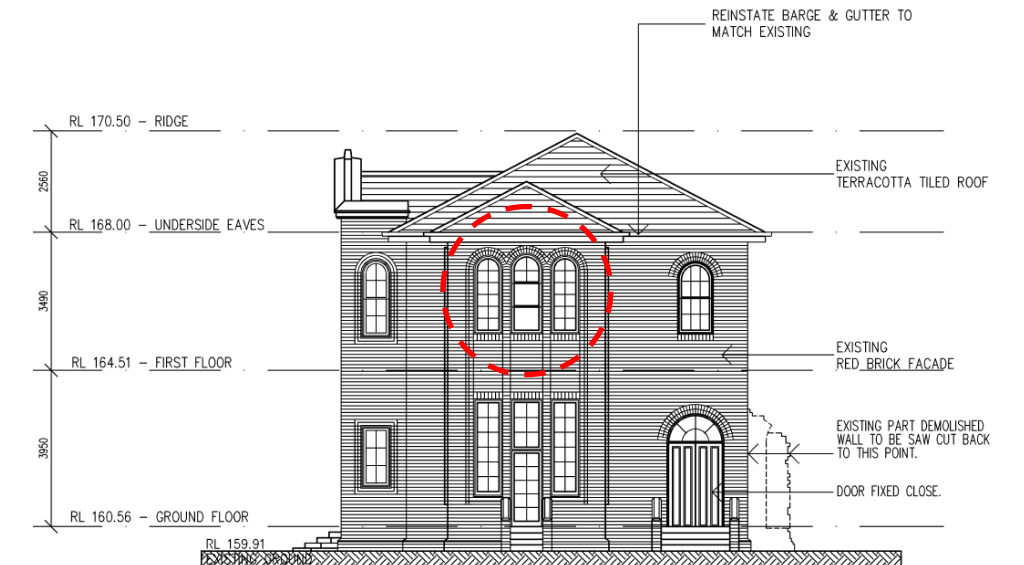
Proposed western elevation of the Monastery building. As indicated in red, this elevation shows the western facing windows of the existing balcony. As per Condition C3, the lower half of these balcony windows are to be obscure glazing to prevent overlooking.
